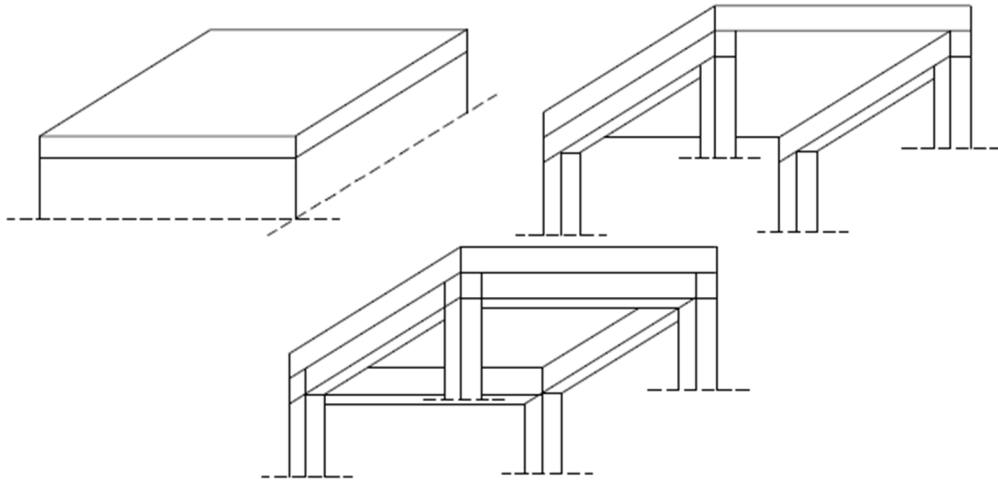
Flat Slab a) on walls, b) on two beams, c) on four beams [3].
